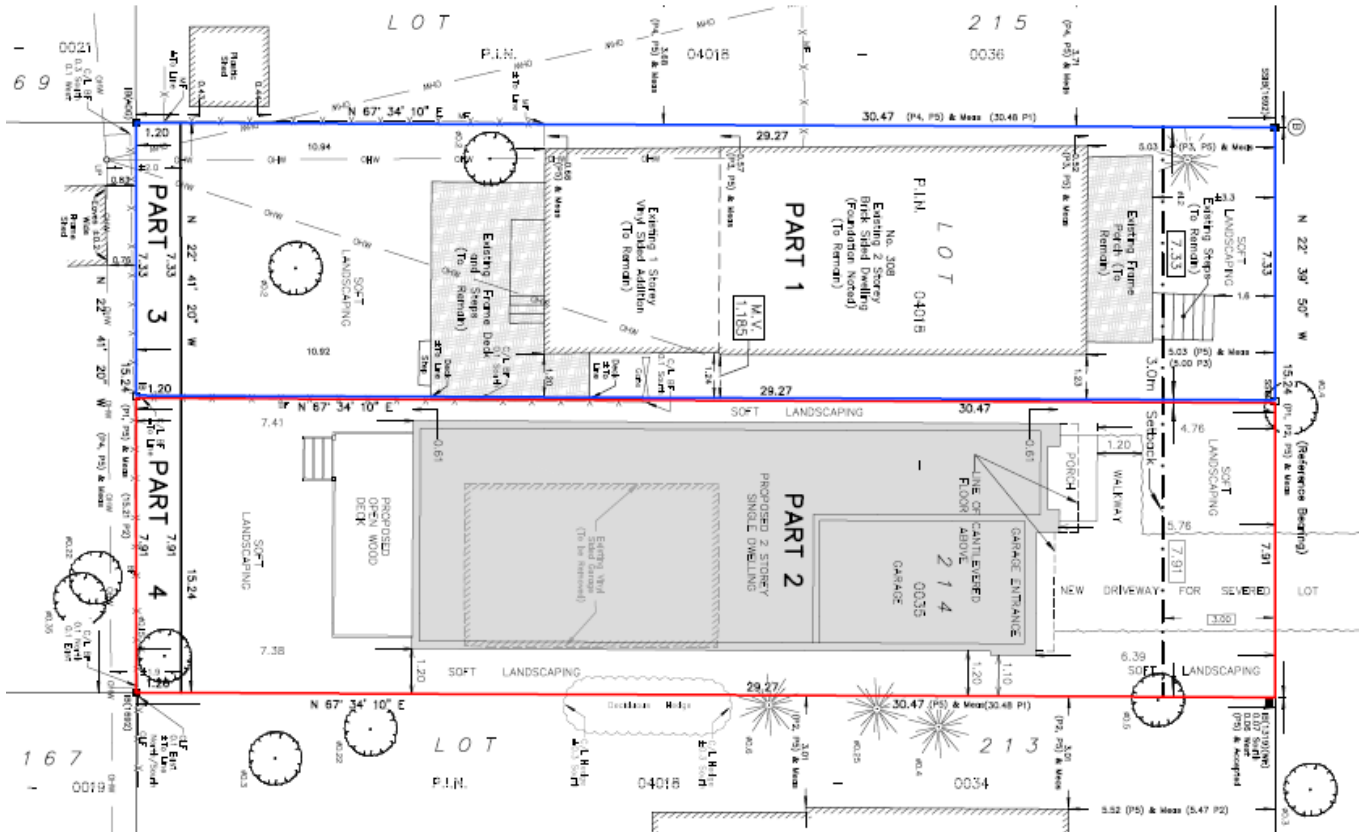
Site Plan sketch illustrating the existing conditions on the retained lot (Parts 1 & 3) as well as the concept sketch proposed for the severed lot (Parts 2 & 4) as part of the previous Consent and Minor Variance applications on the lands.
